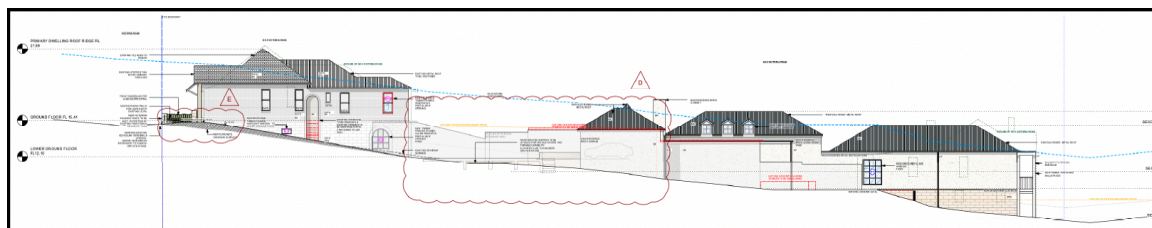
Eastern elevation showing contravention (in blue dashed line) in the context of the existing dwelling (to left).
